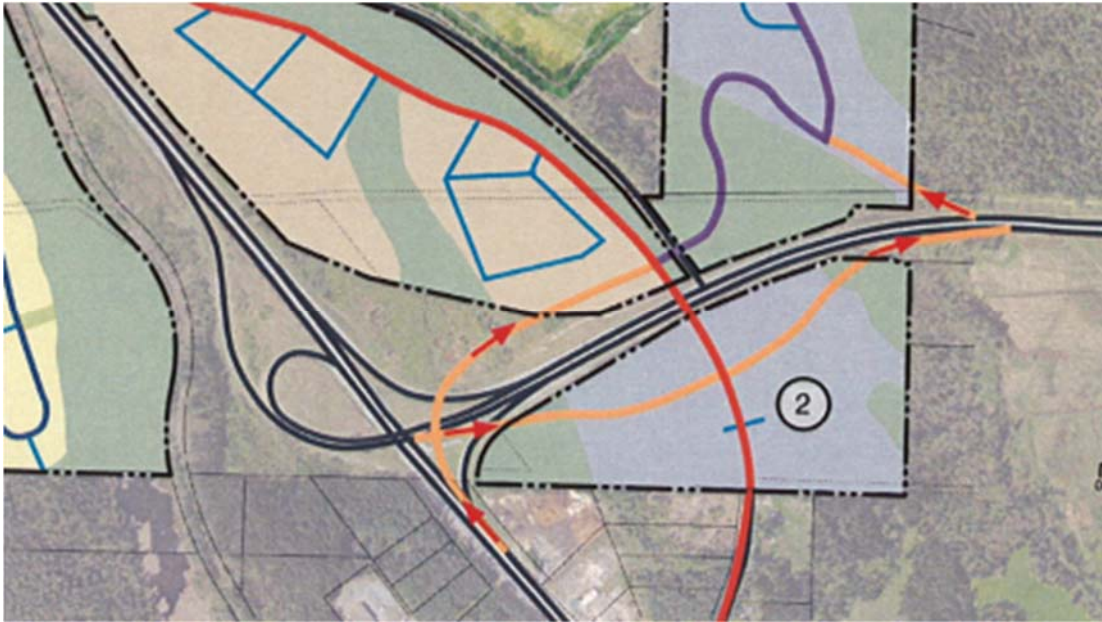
2009 Duke Point Highway Proposed Ramp Connections
